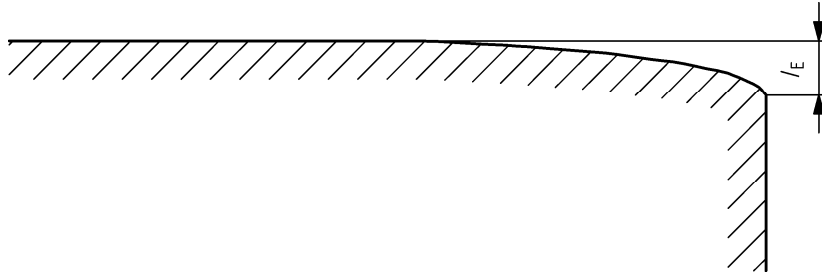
Transverse profile of a pavement surface showing edge slump I_E
